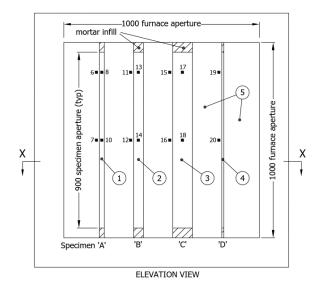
Wall linear gap systems H1-H4 – assessment 3 (as shown in WF 157402) – dimensions in mm
